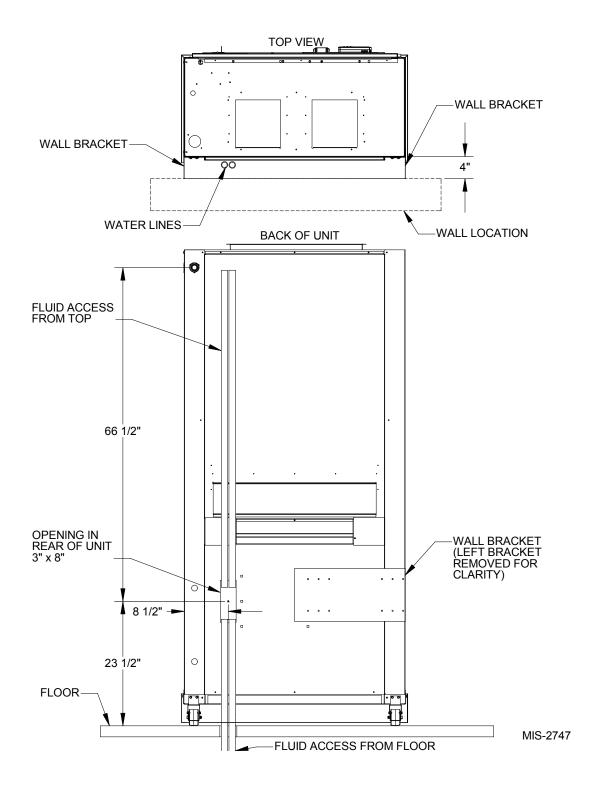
Fluid Connections on Unit without Ventilation Wall Sleeve
